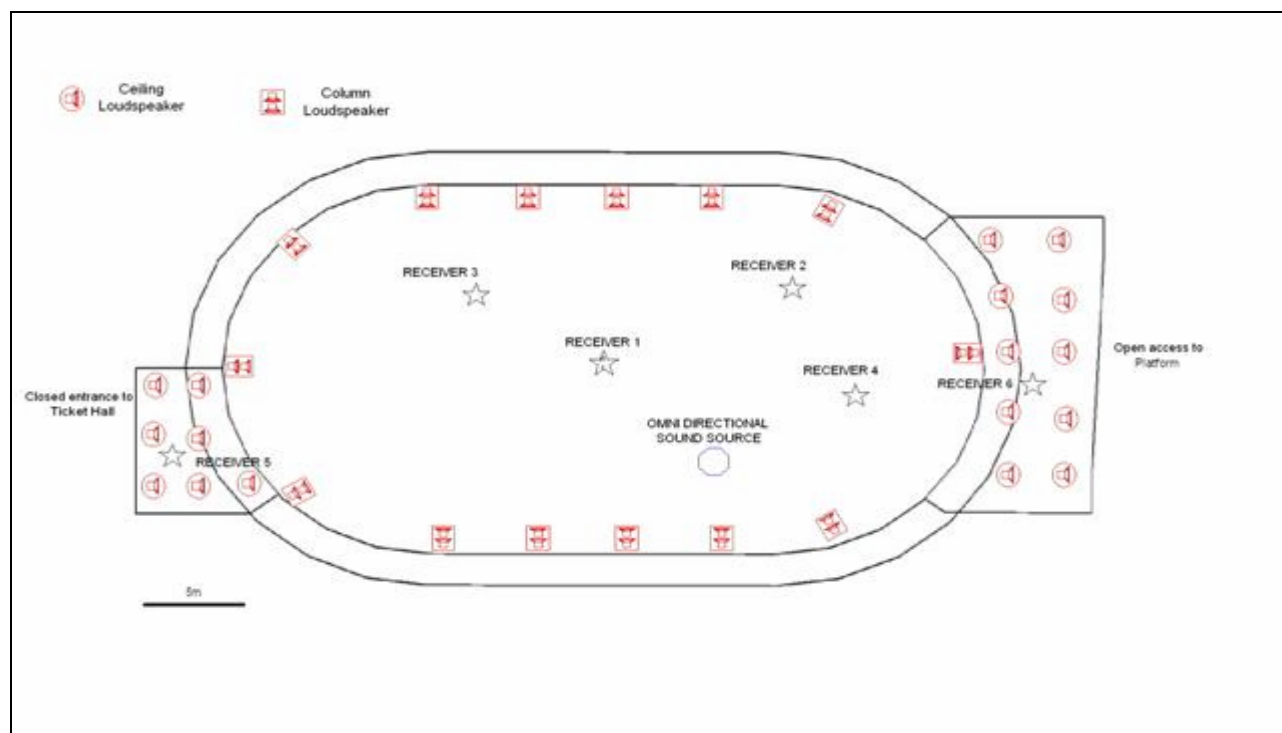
Heathrow Terminal 4 Underground station, Ticket hall plan
